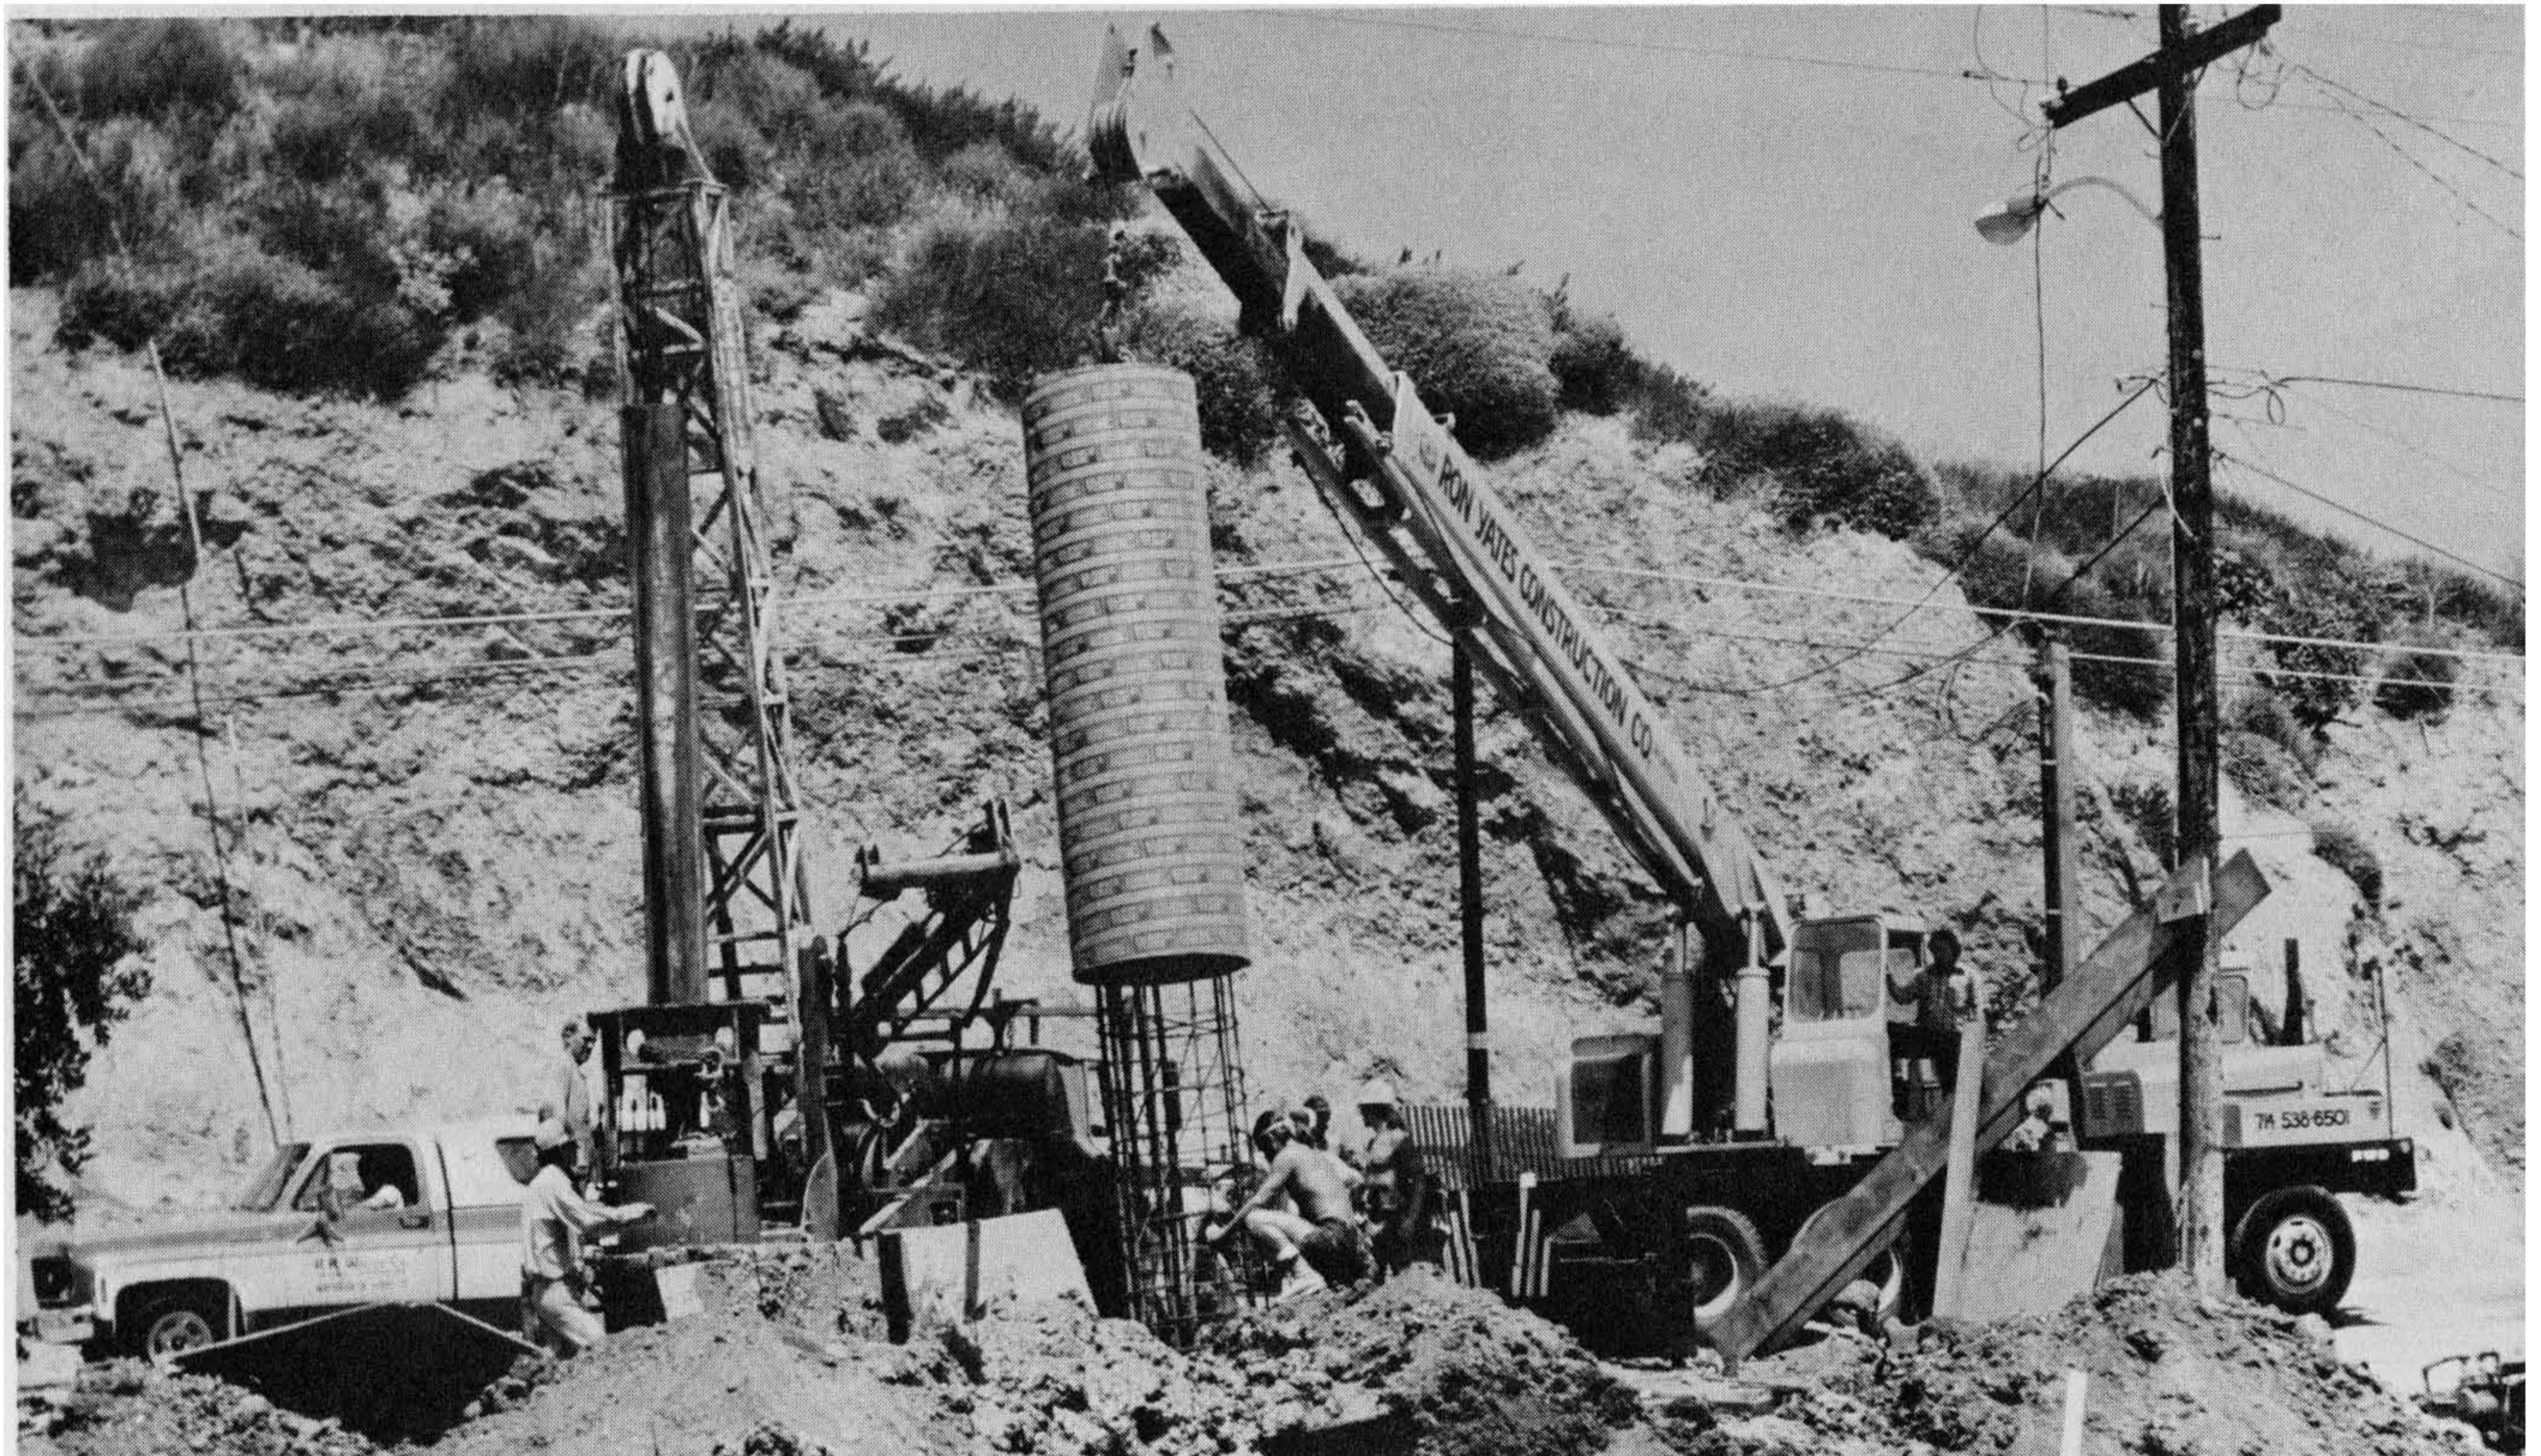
through 6-19 illustrate construction of a beach-front cast-in-place foundation. This is primarily an engineer-designed foundation where either the building or the grading inspector performs inspections. Such construction requires that the foundation be extended down into competent bedrock under the beach sand, and that the depth of penetration must be inspected and approved by
